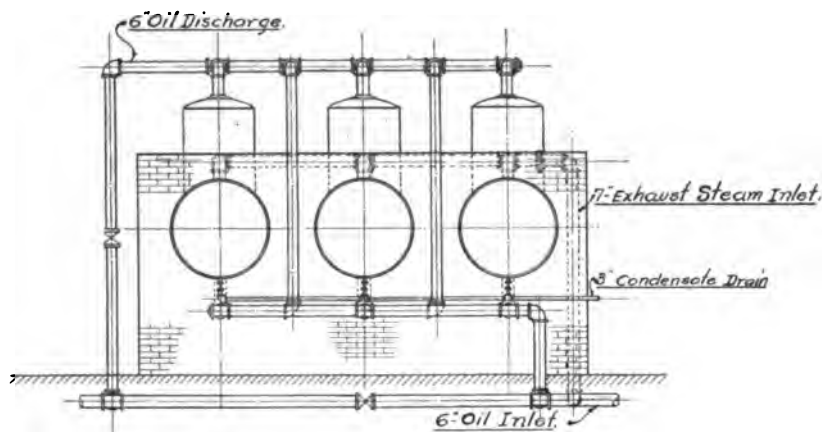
FIRST OIL-HEATING PLANT. END ELEVATION.
